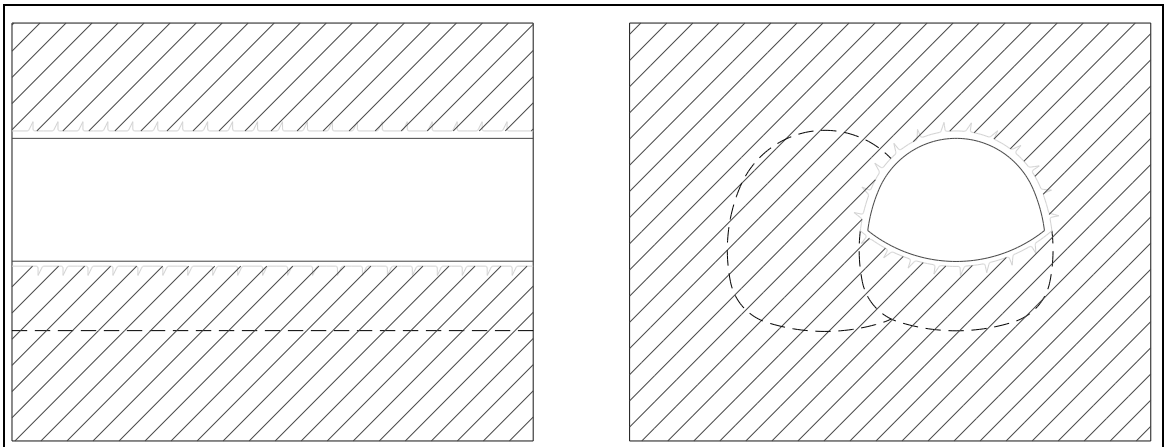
Stage 6 – OB TH Excavated and Shotcrete Lining Installed
